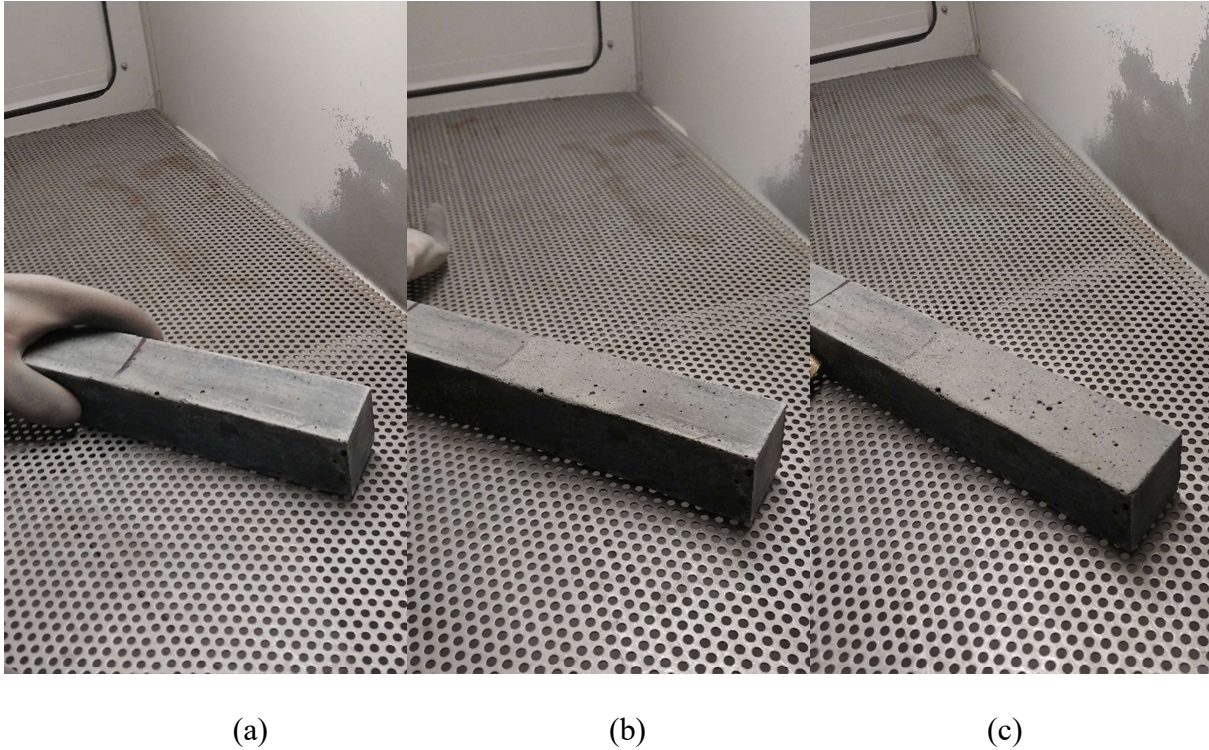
3 (a) UHPC prismatic specimen, (b) UHPC prismatic specimen sand blasted surface halfway, (c) UHPC prismatic specimen sand blasted surface complete
